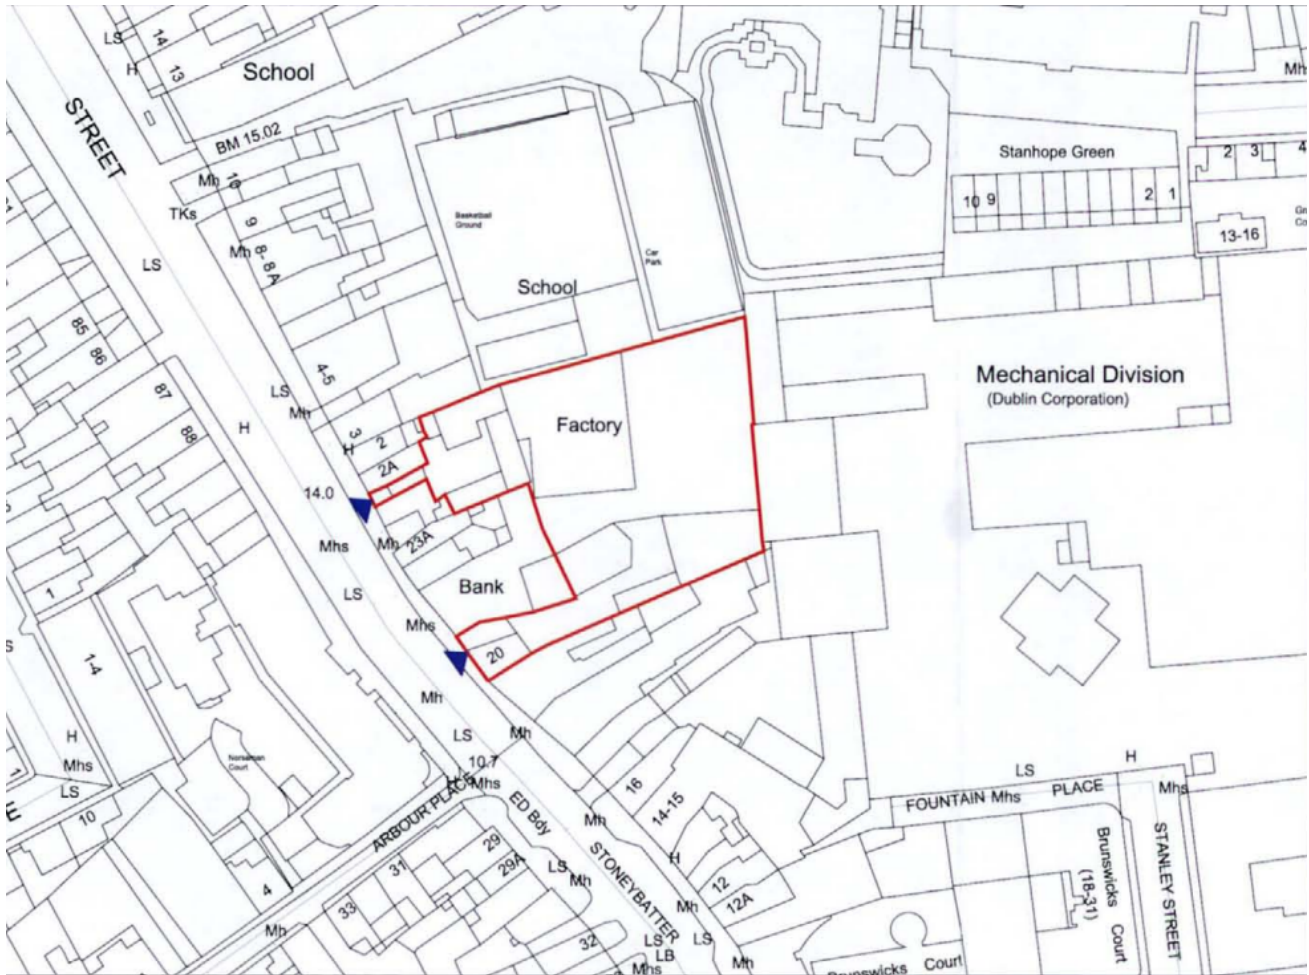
Site Layout (Source: Boyes Rees Architects as displayed on DCC Planning Register)
